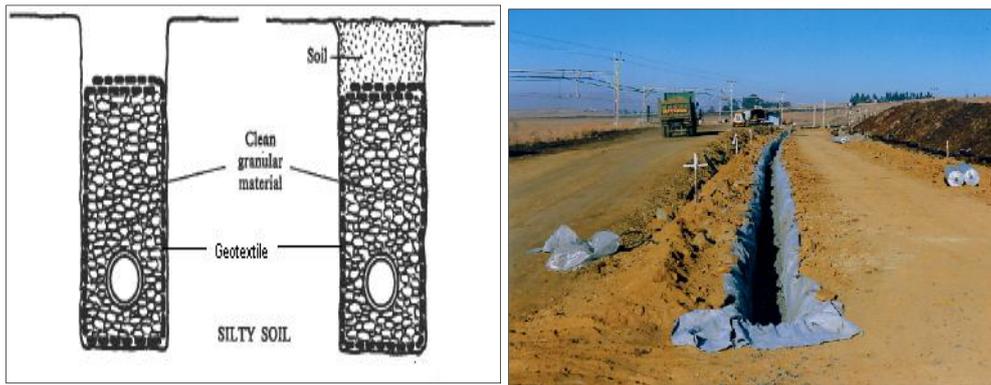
Geotextile acts as a filter in subsurface drainage application alongside a road (Kaytech)
